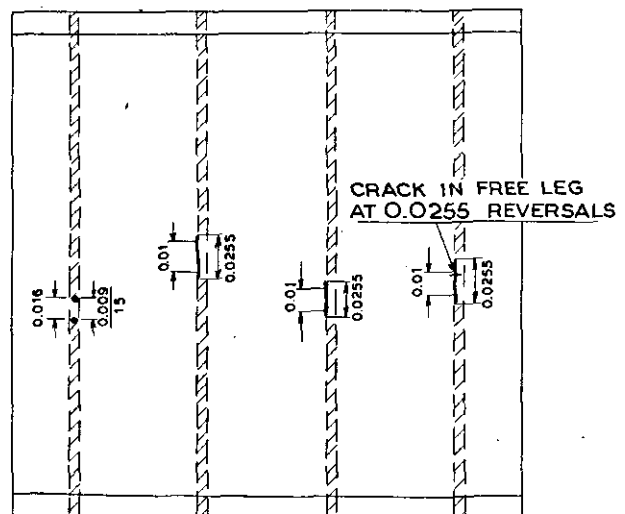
The cracks and peeling of panel Ib-75-3.
